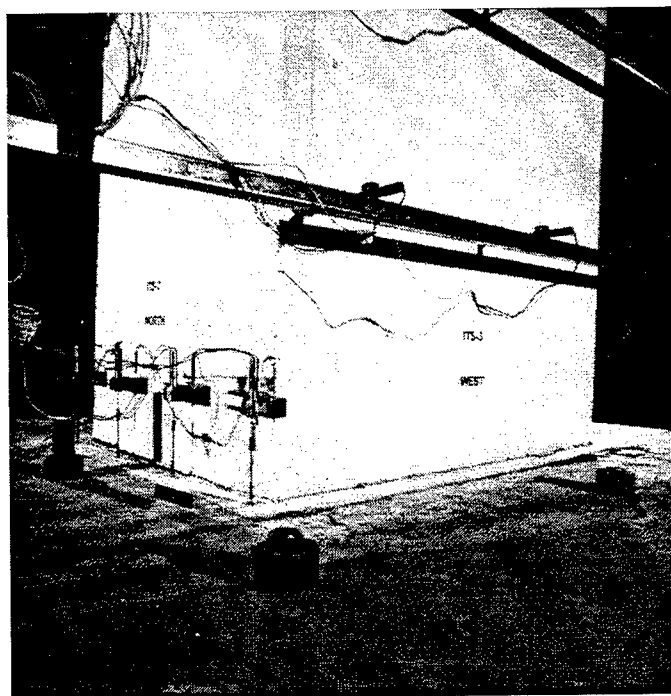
ITS-3 view of north and west walls, imposed top deflection of 1.6 in. towards the west.
